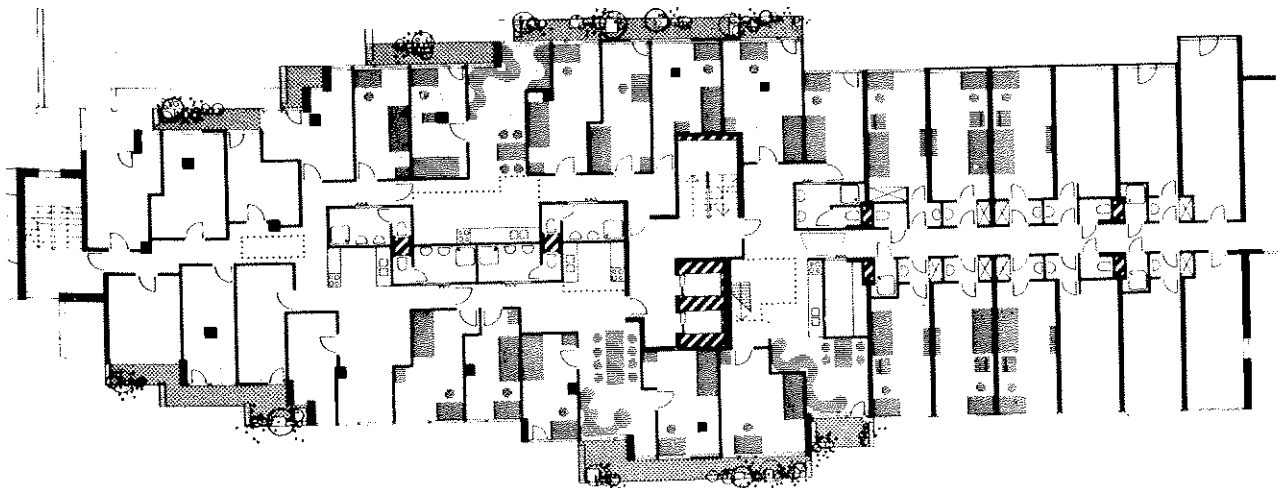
Plan of "la Mémé" (left) and "les Fachistes" (right).
